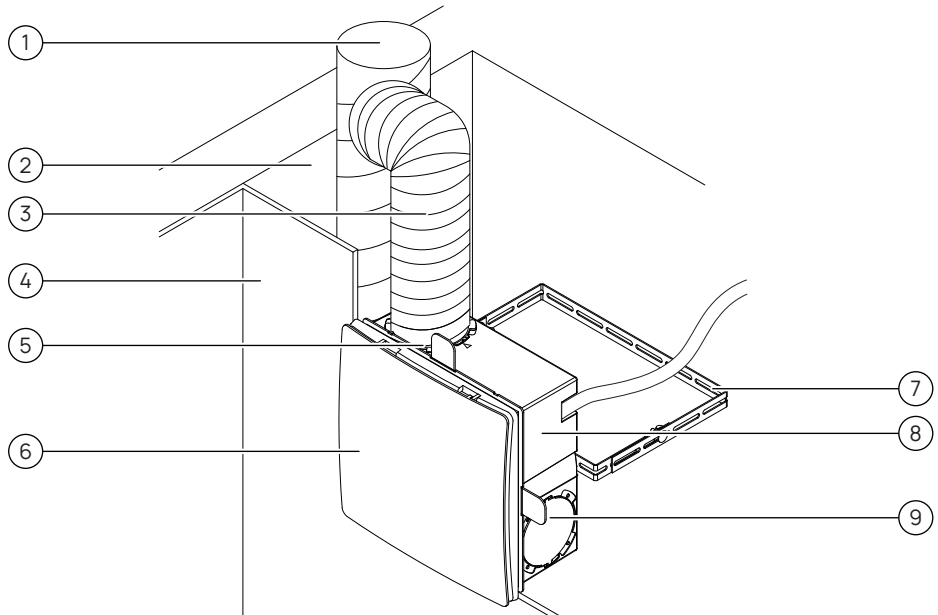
Flush-mounted variant – drywall installation with mounting bracket
